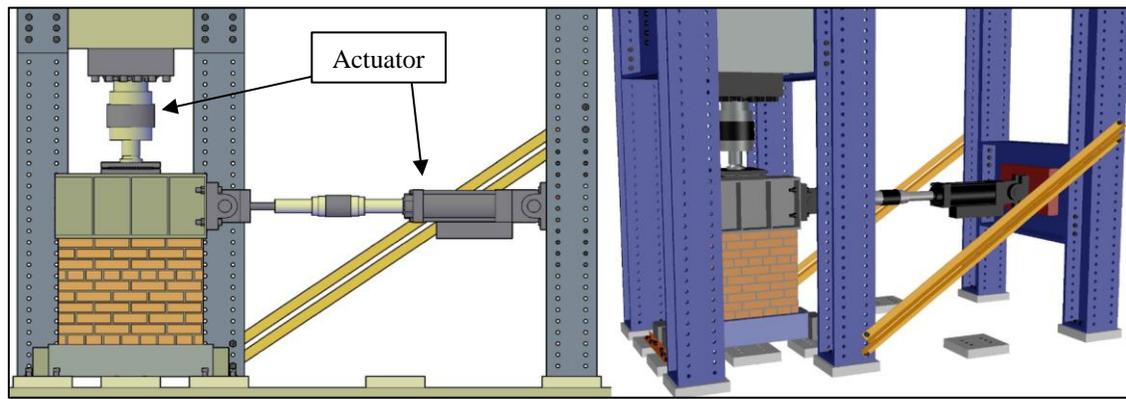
Static-cyclic lateral loading test setup on masonry wallets
